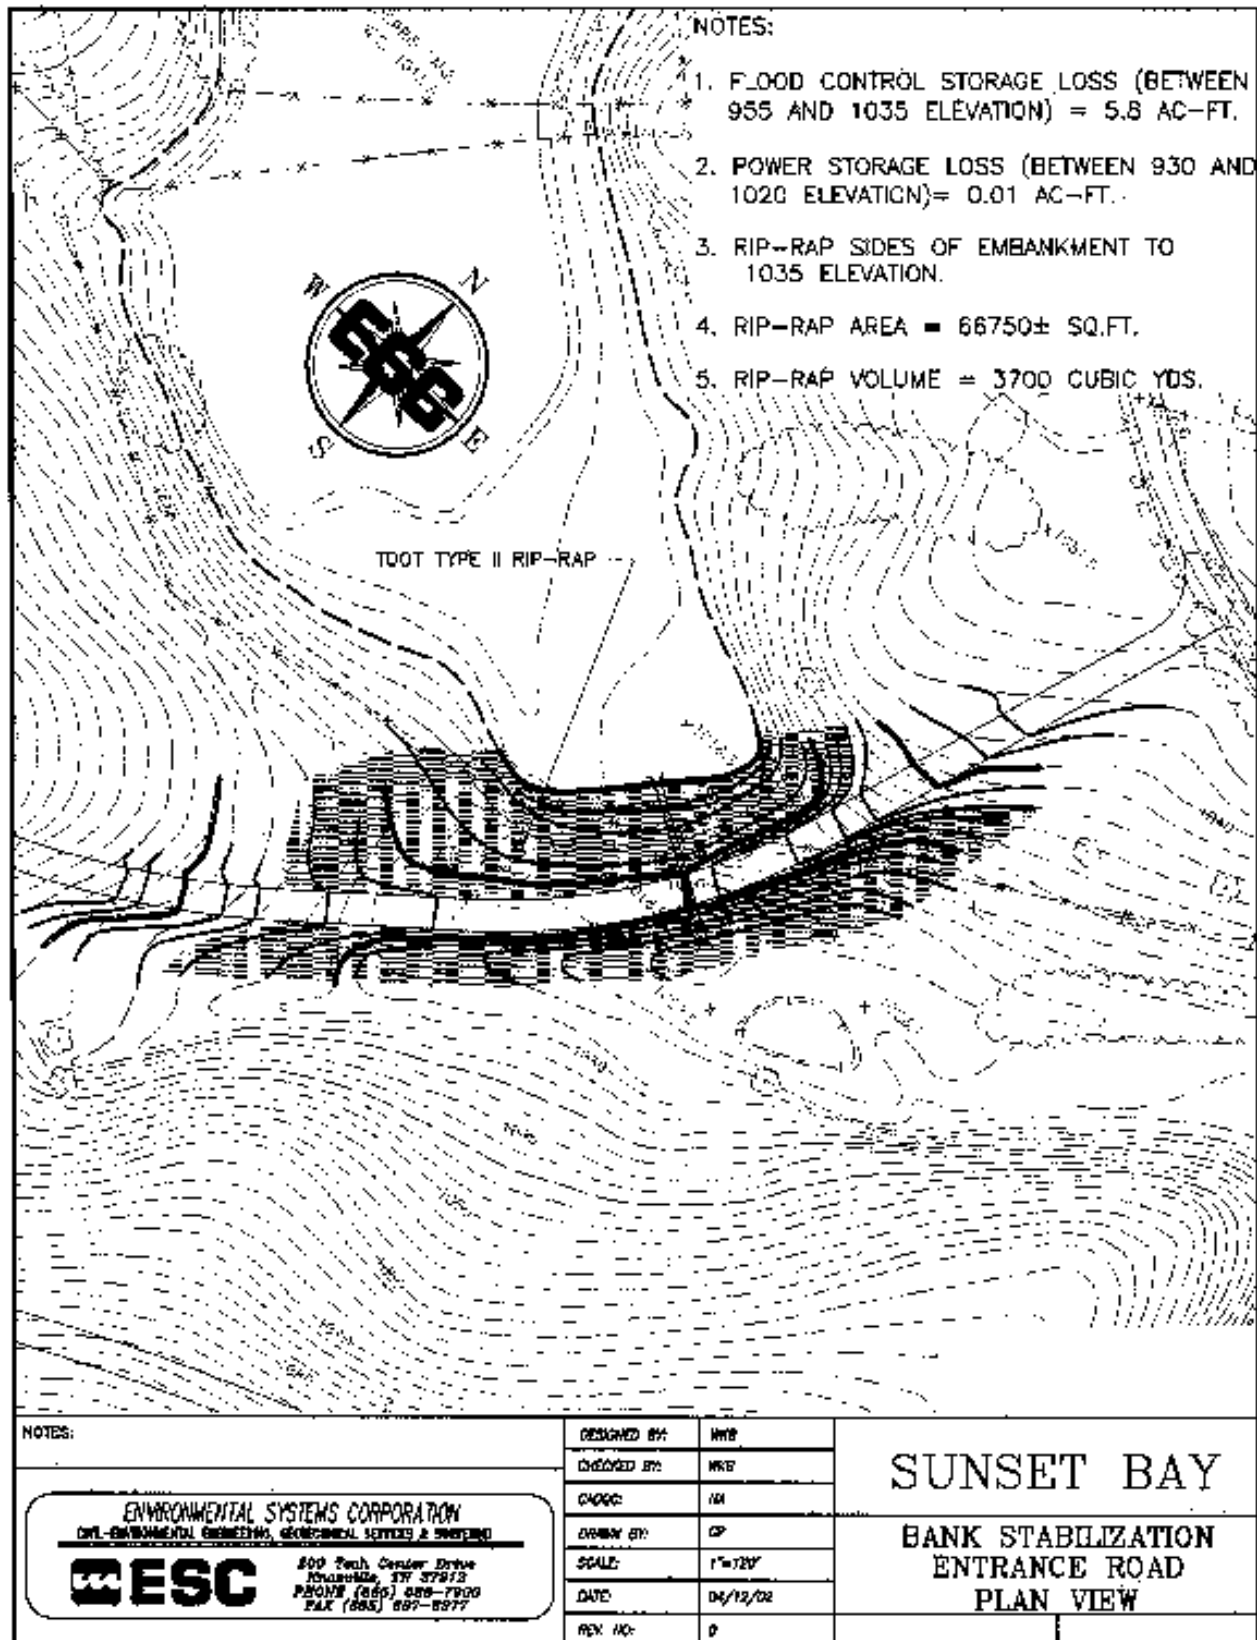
Sunset Bay Bank Stabilization Entrance Road Plan View
